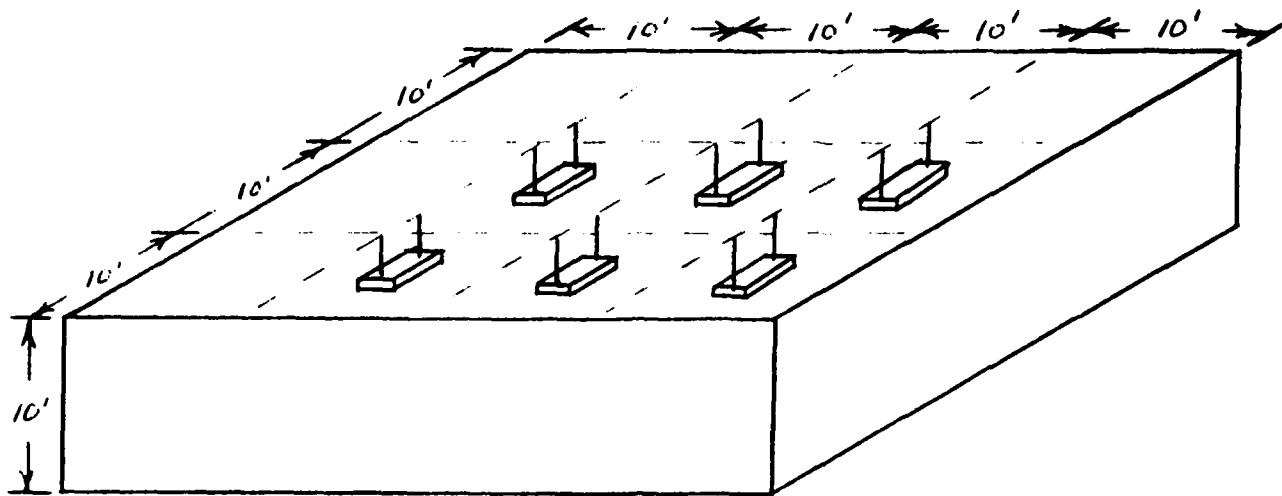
Room Layout for Example 2. Luminaires are suspended on 2' stems.
